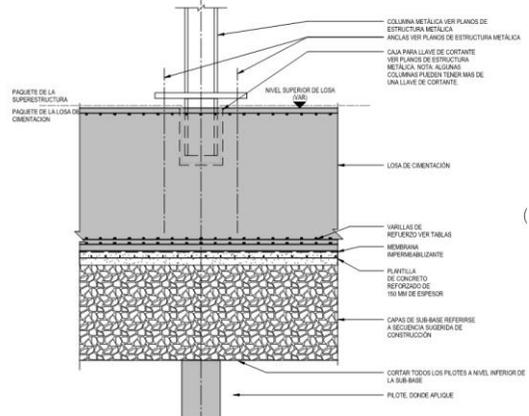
The structural section of the raft, from top down: reinforced raft slab, water-proofing and corrosion membrane, reinforced blinding slab, tezontle, geo-grid, settlement reducing pile..
